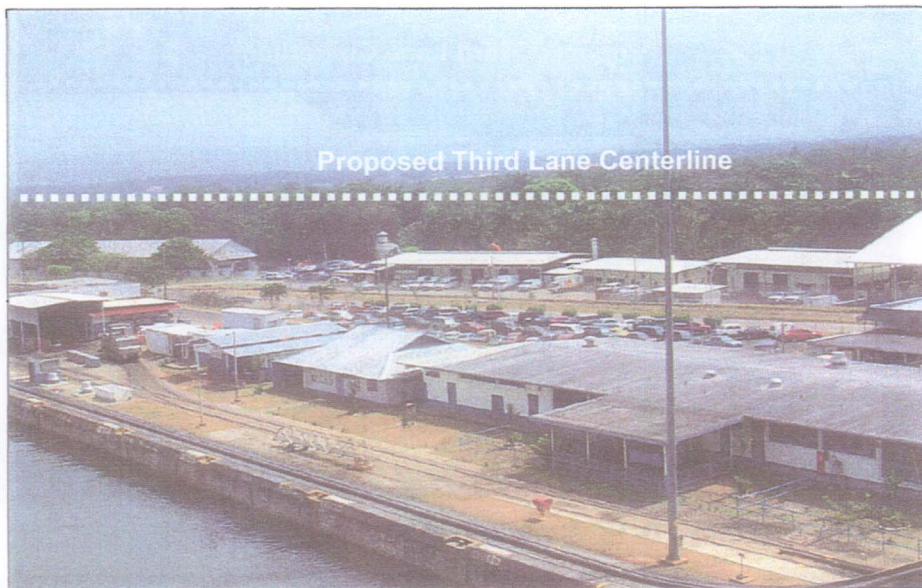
View Of Esplanade, Looking Northeast From Middle Wall Operations Building
